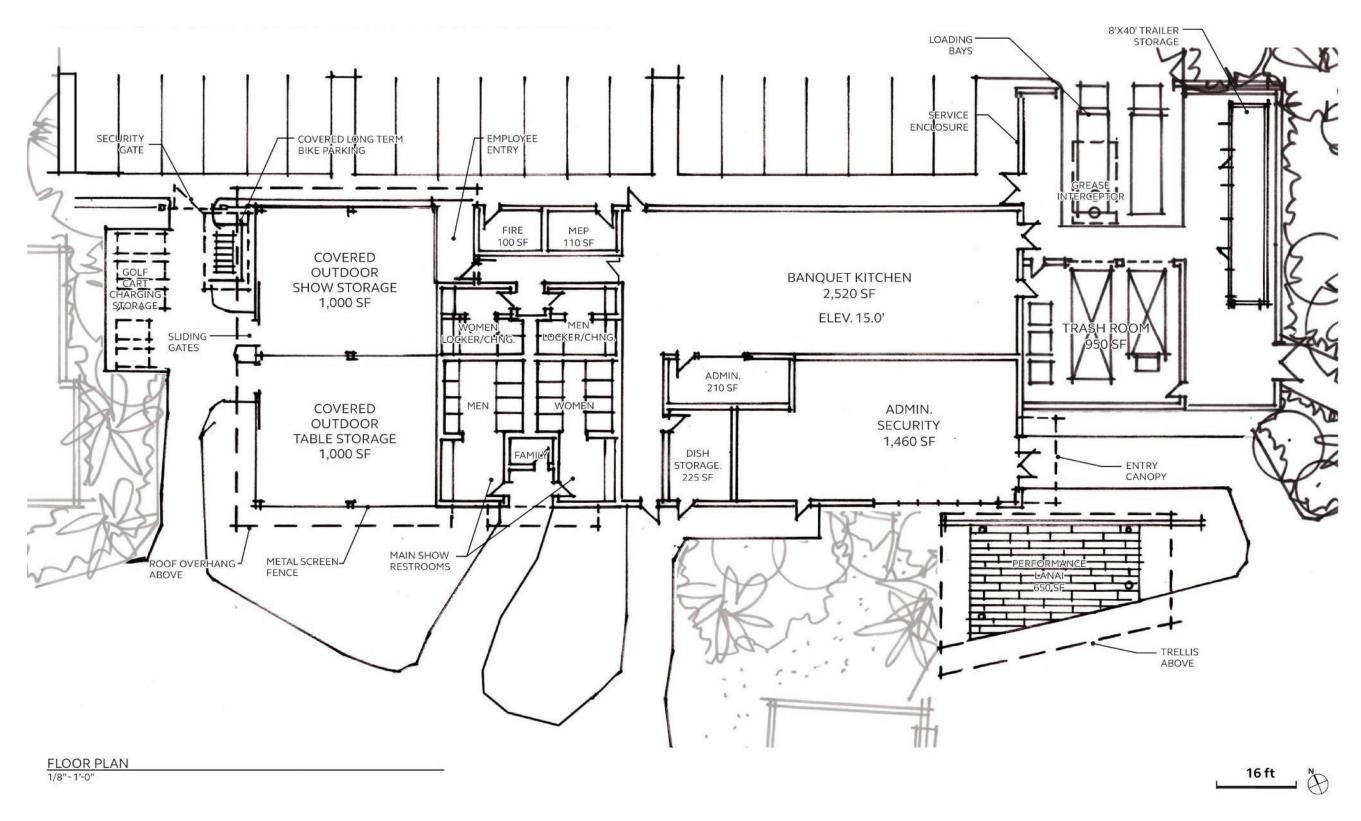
Existing Wedding Chapel and Support Building (Buildings <u>1210</u> and <u>1311</u>) – Preliminary Plan
